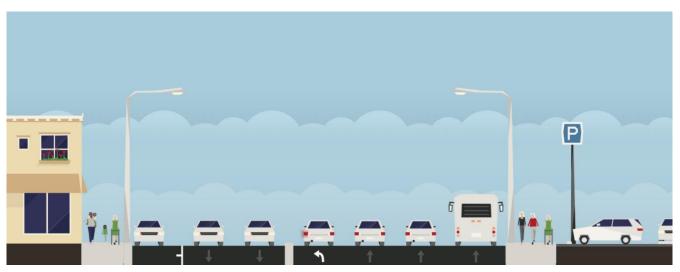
Jasper Avenue Facing East (West of 116 Street)
